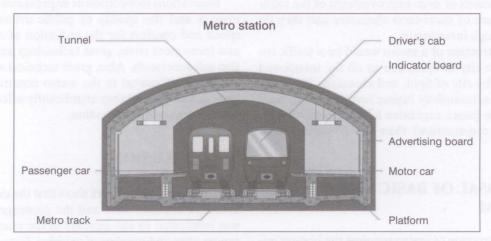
Schematic presentation of the metro station in shallow tunnel
